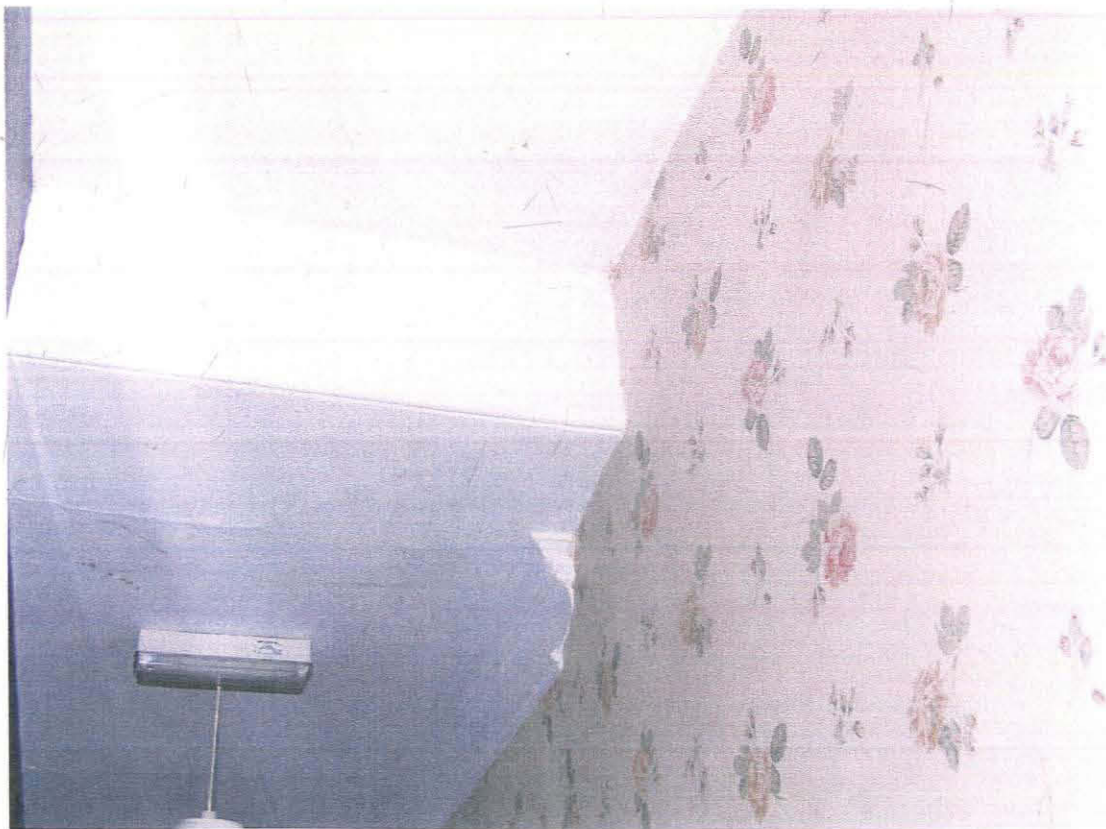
Break in ceiling and termination of cornice on the first floor landing of Unit 1, taken from the east (130)
